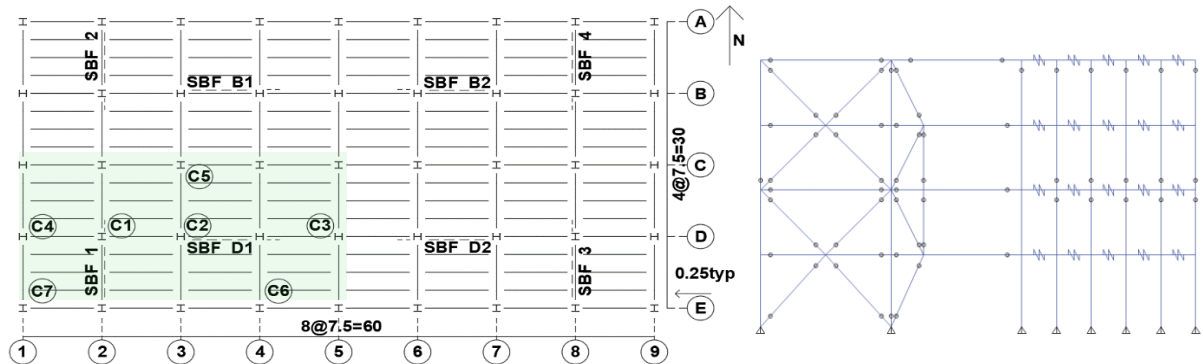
Plan view of 4-storey SBF building (a) and the OpenSees model of 1/4 of building floor plan (b).
